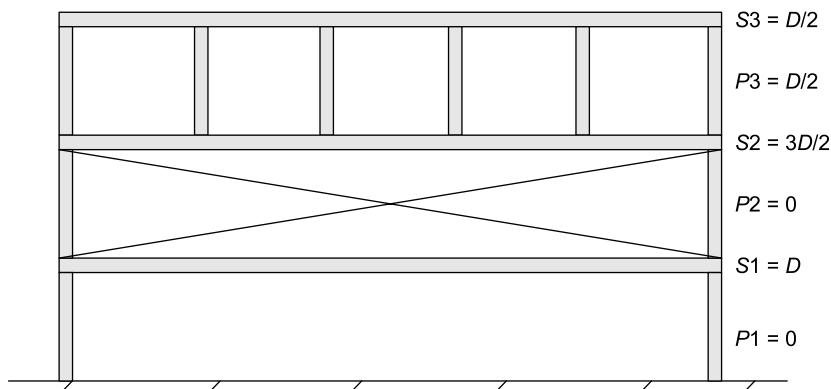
Installation of Reshores Under Slab 2 on Day 26.
